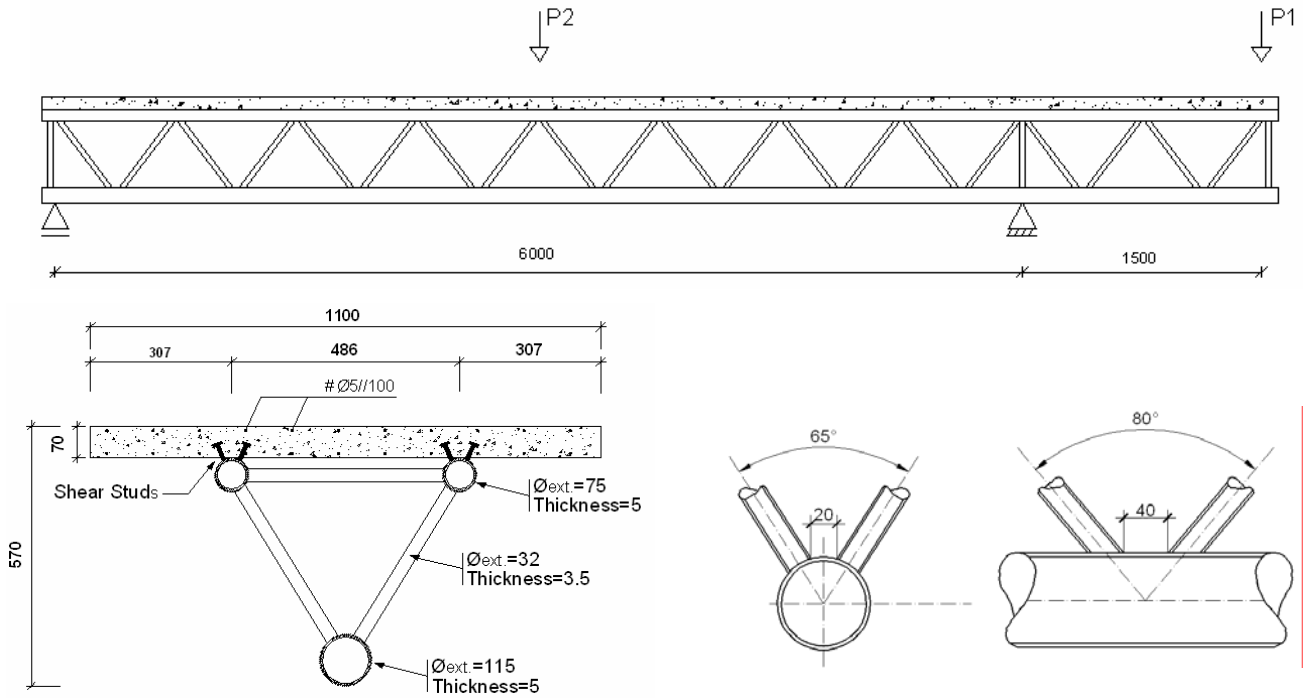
Specimen longitudinal scheme, cross-section and inferior KK joint geometry (mm).
